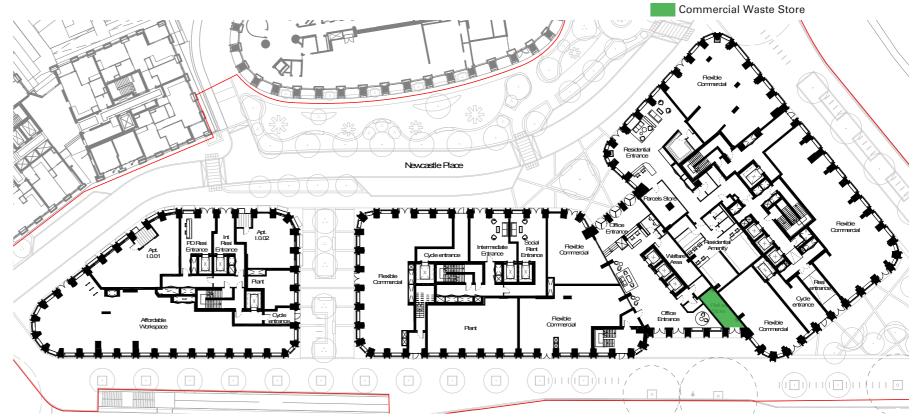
Ground Floor Plan\_ Commercial Waste Store Location
